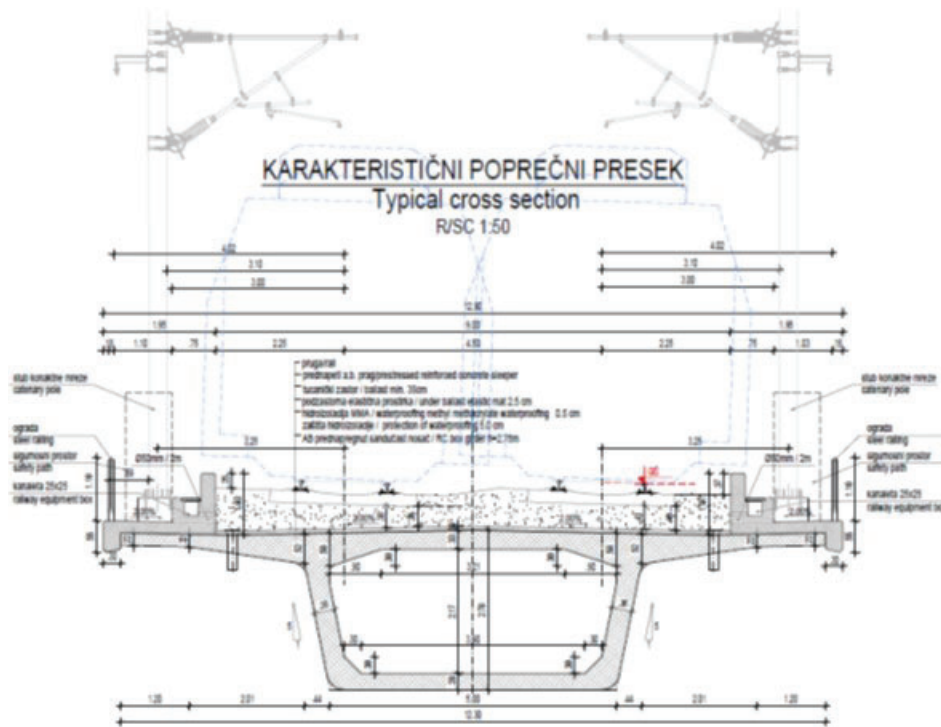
Bridge at km 117+155 – Typical cross section of concrete structure
